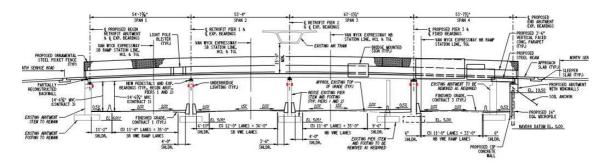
Proposed elevation view of the 133rd Avenue Bridge over Van Wyck Expressway.
